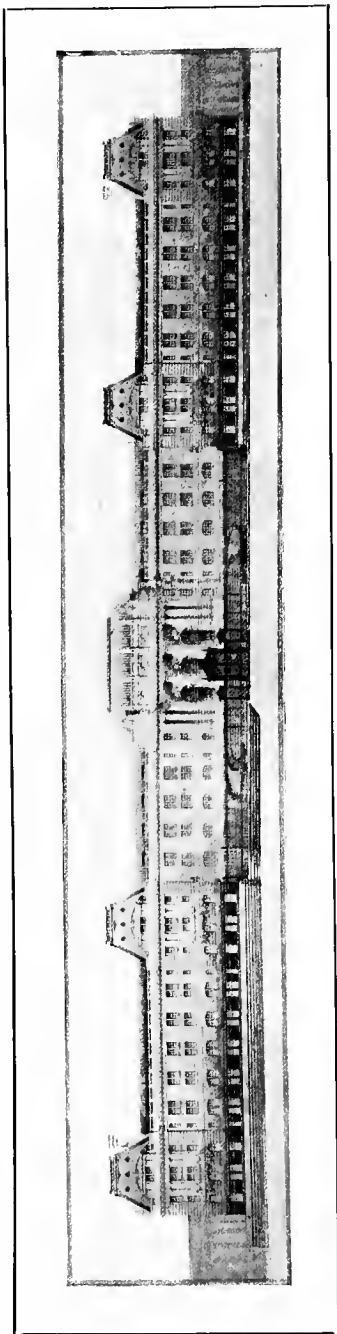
ELEVATION OF CADET QUARTERS ON THE SIDE TOWARD THE CAMPUS, ANNAPOLIS.
